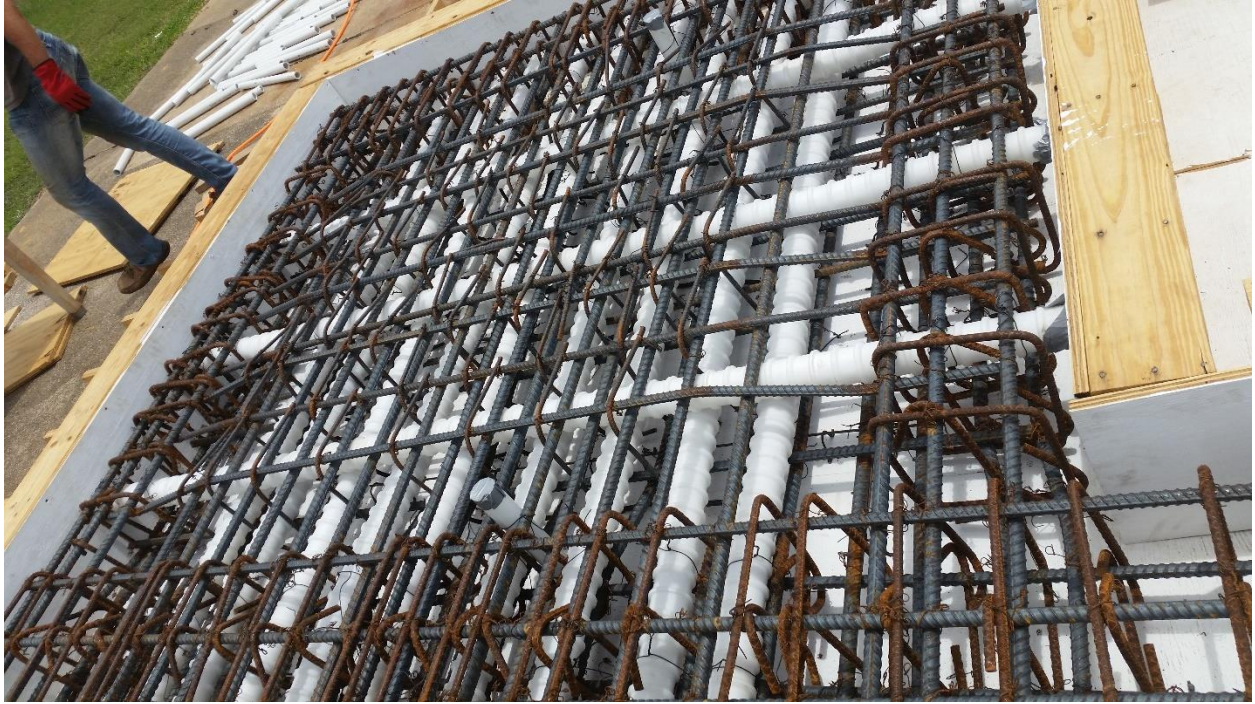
Specimen 1- Post-Tensioning Bar Ducts, Reinforcing Steel Cage, and Formwork
